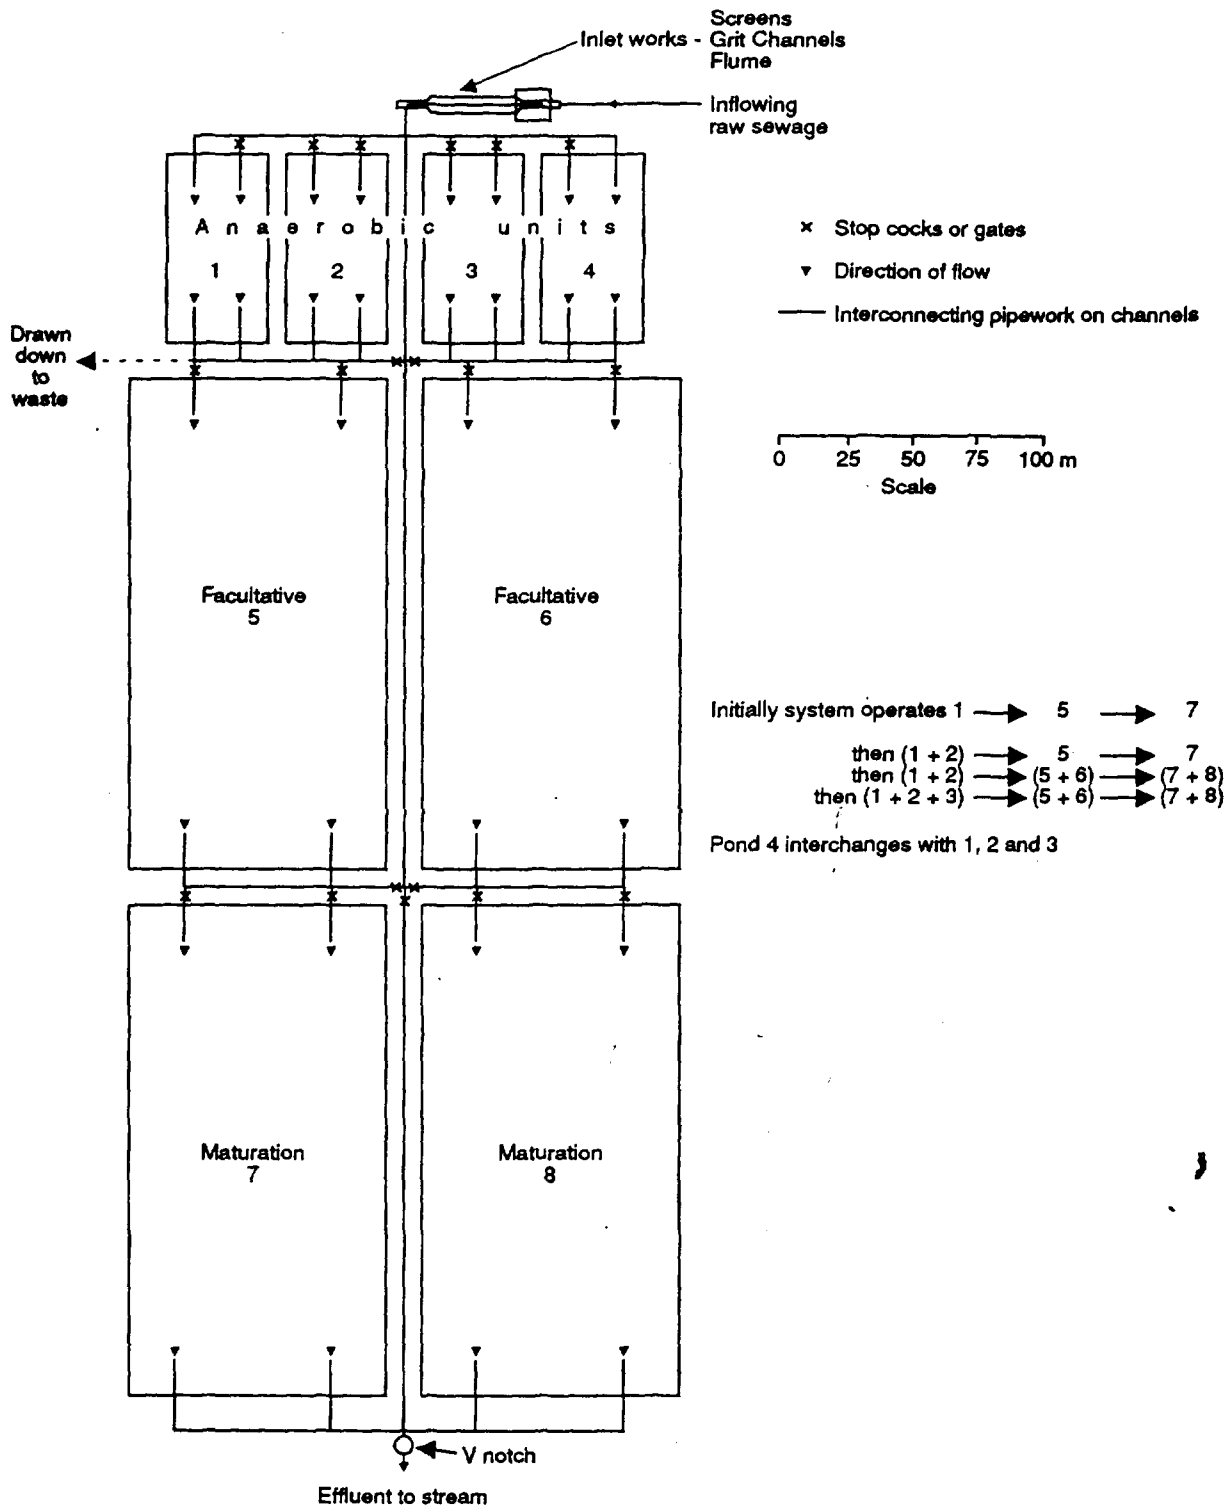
Example layout of waste-stabilization ponds. Adapted from Arthur 1983.
